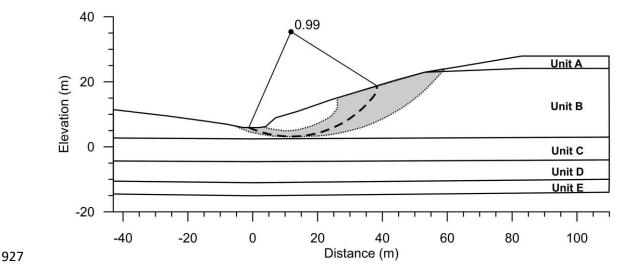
Cross-section D-D', view toward the north, piezometers at location 32145,
